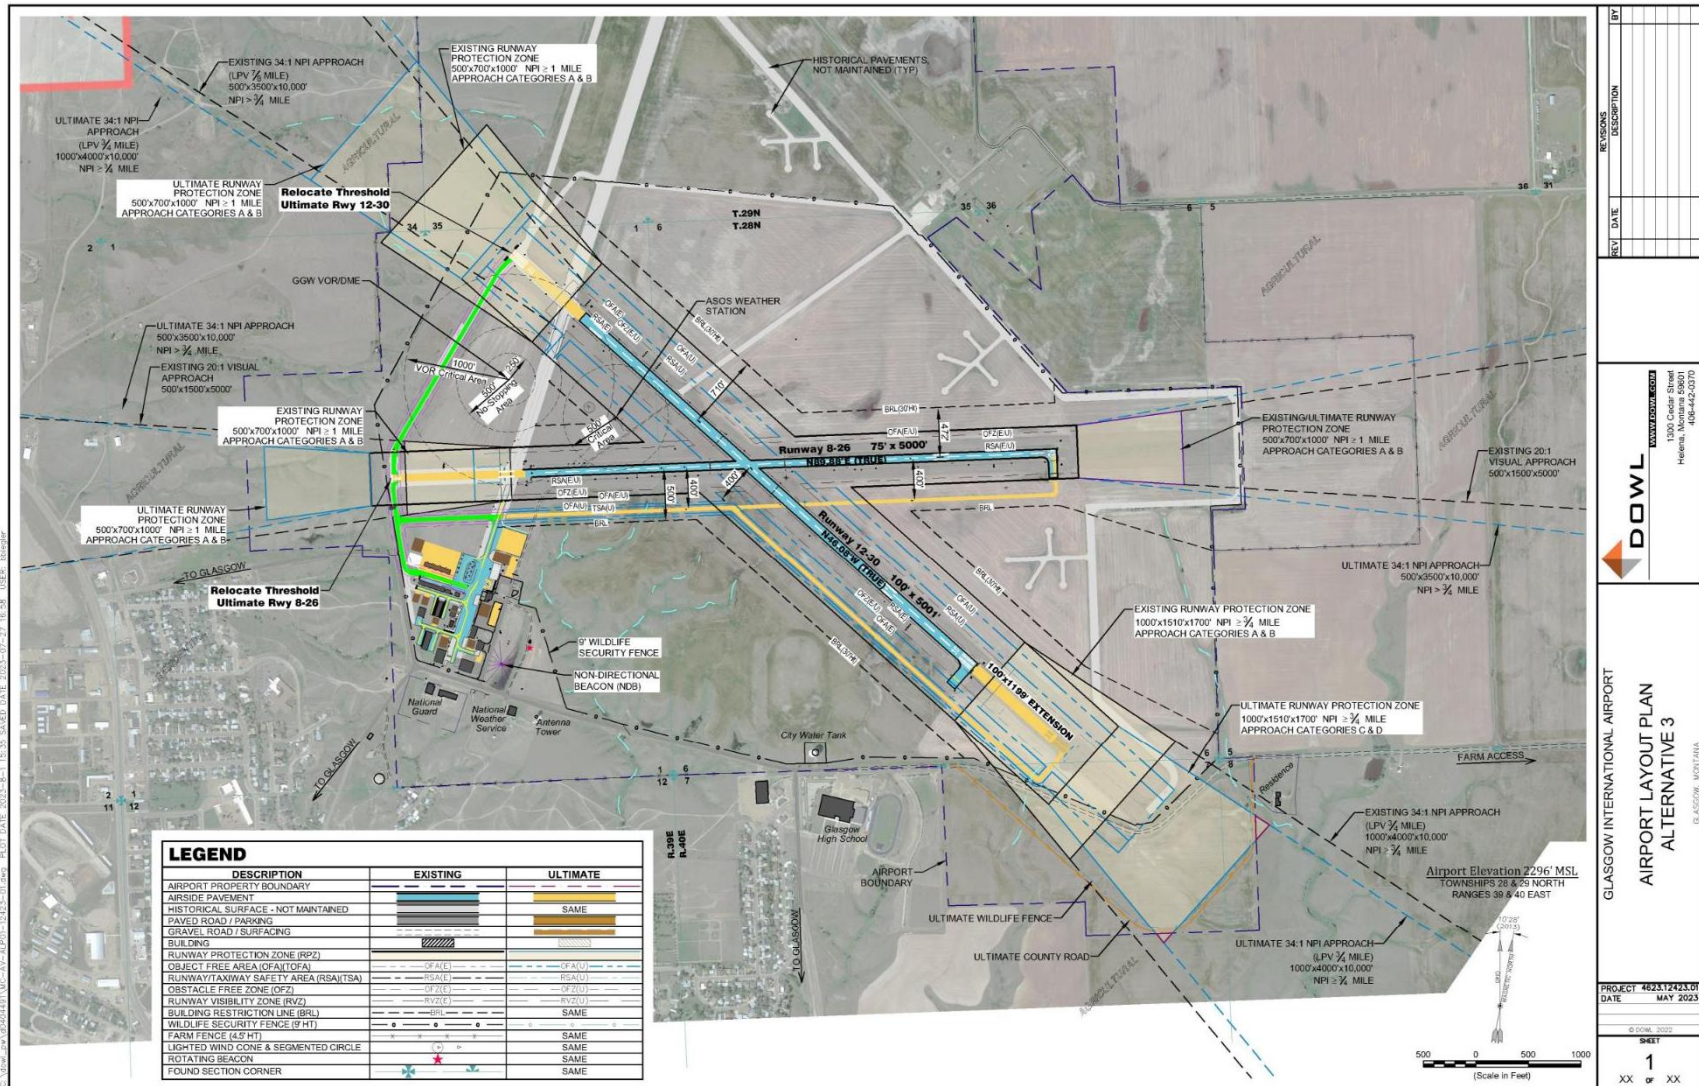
Alternative 3 – New Entrances and Runway Extensions
